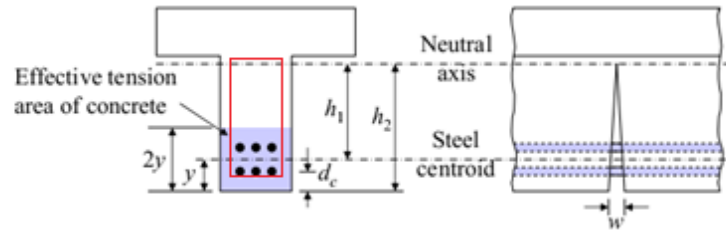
Beam cross-section with transverse reinforcement (Jiravacharadet 2017).
